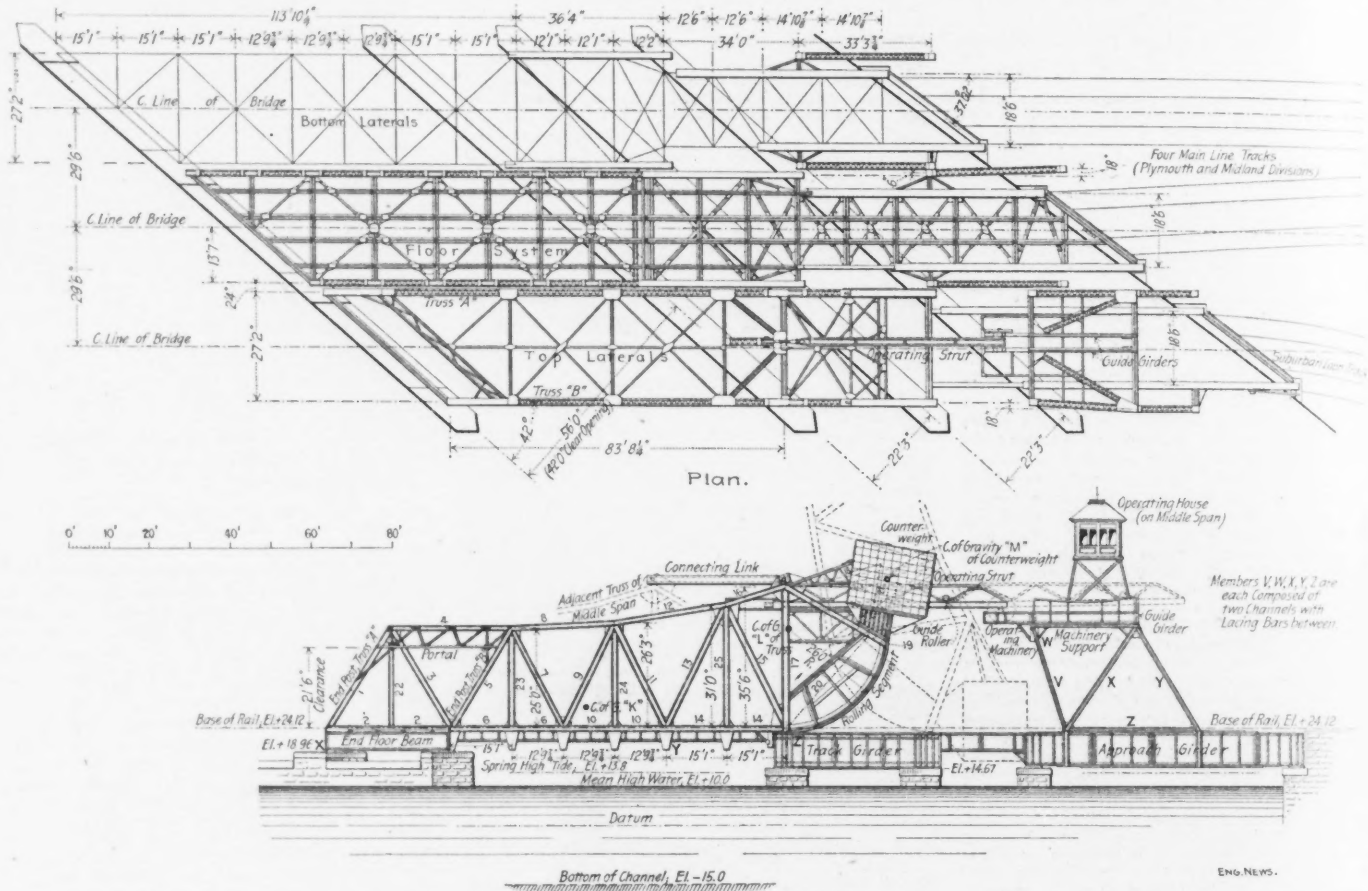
PLAN AND ELEVATION OF SIX-TRACK ROLLING-LIFT DRAWBRIDGE, AT BOSTON, MASS.; NEW YORK, NEW HAVEN & HARTFORD R. R.
